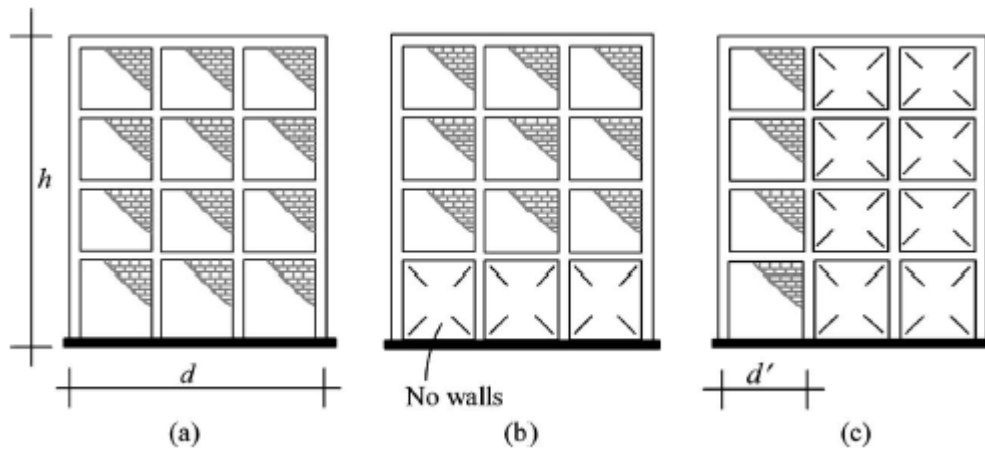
Different arrangements of masonry infill walls in RC frame
